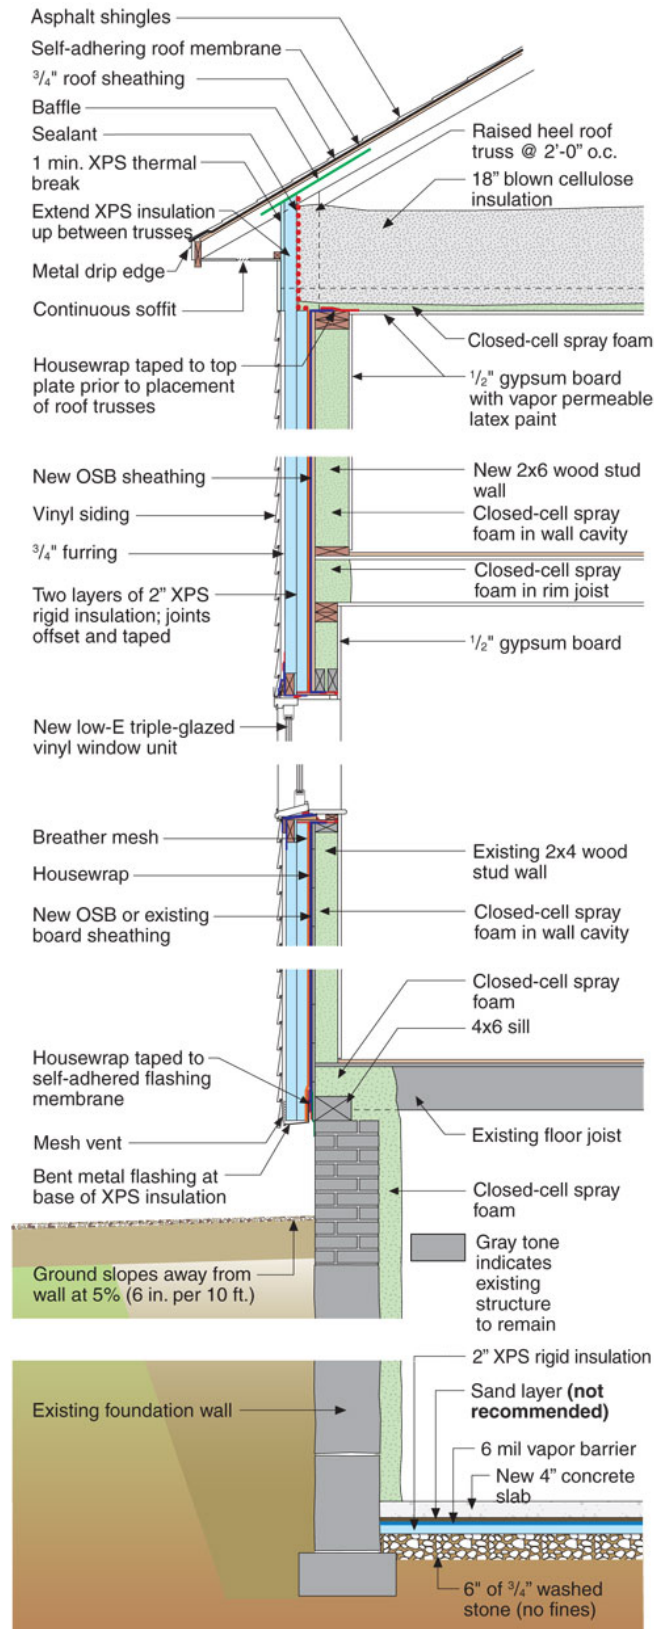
Schematic wall section for Test Home 5 enclosure retrofit strategy
